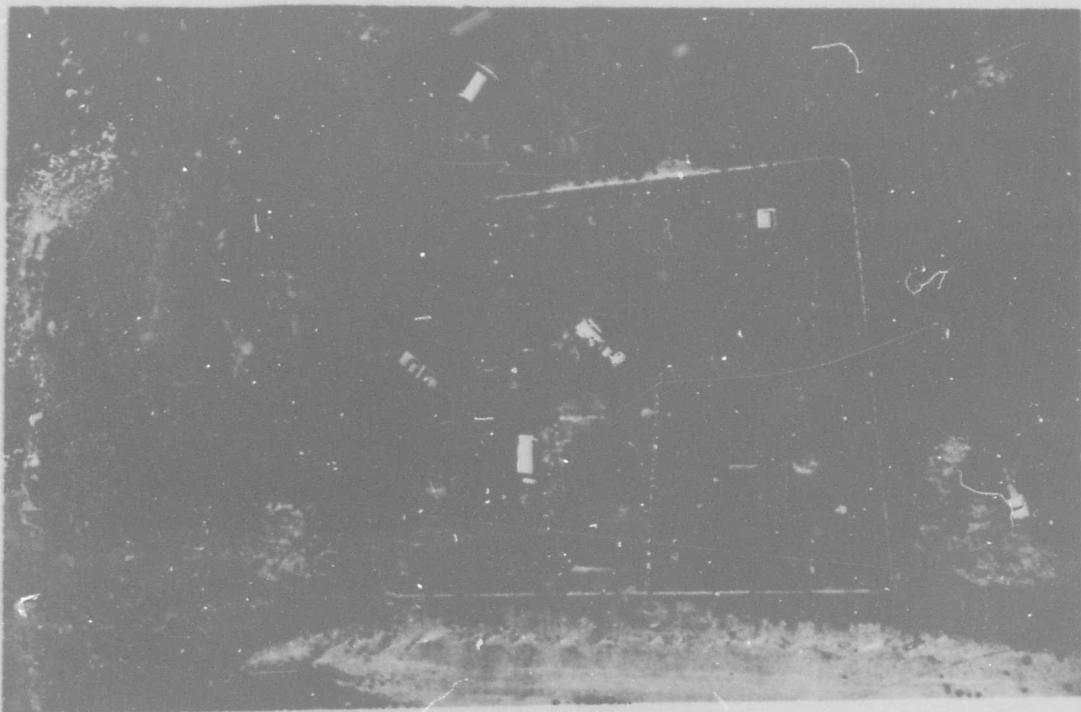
Aerial View Showing Test Bed and Excavation for Test Structures in Progress.
